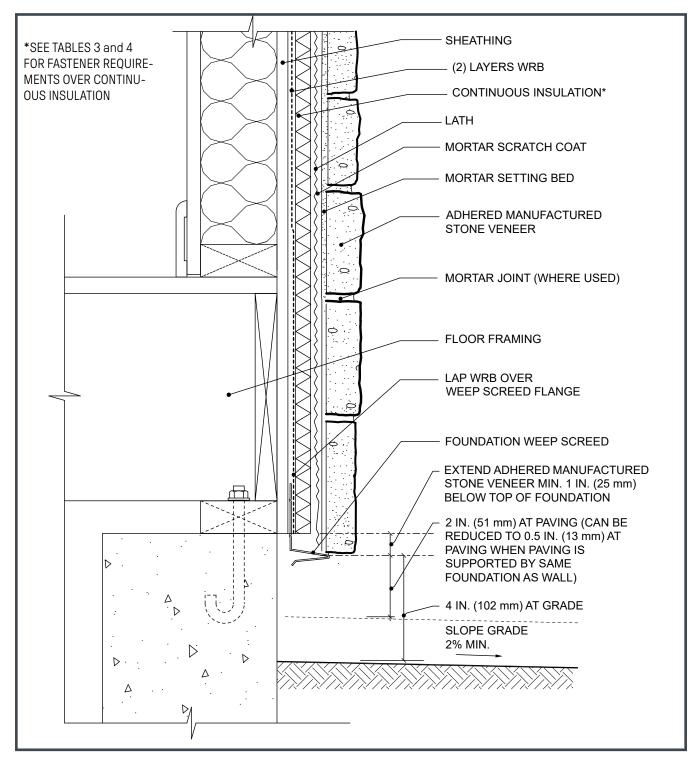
Foundation Wall Base - AMSV Overlapping Foundation
